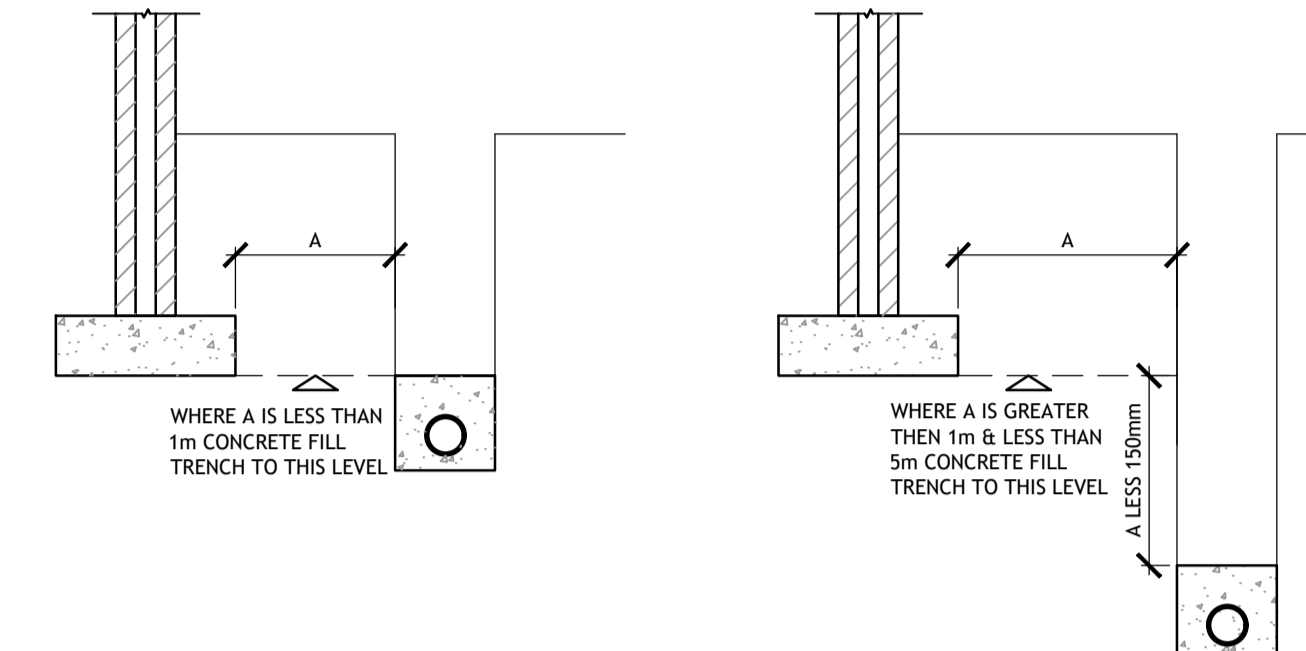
DETAILS ABOVE TO BE USED FOR SURFACE WATER NETWORK
